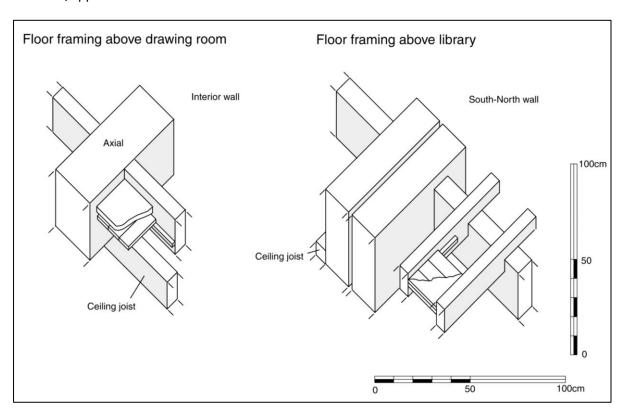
Axonometric cross-sections of the first floor framing of the South Range. Separating ceilings from floors prevented movement and cracking, while the plaster on battens deterred loss of heat and deadened the transfer of noise (Andy Isham).
